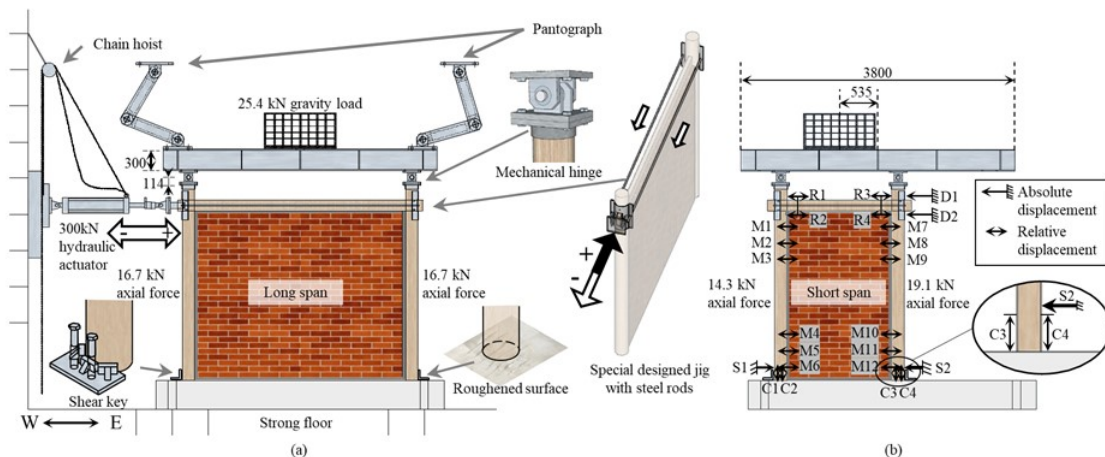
Test setup: (a) long span, (b) short span (length unit: mm).
